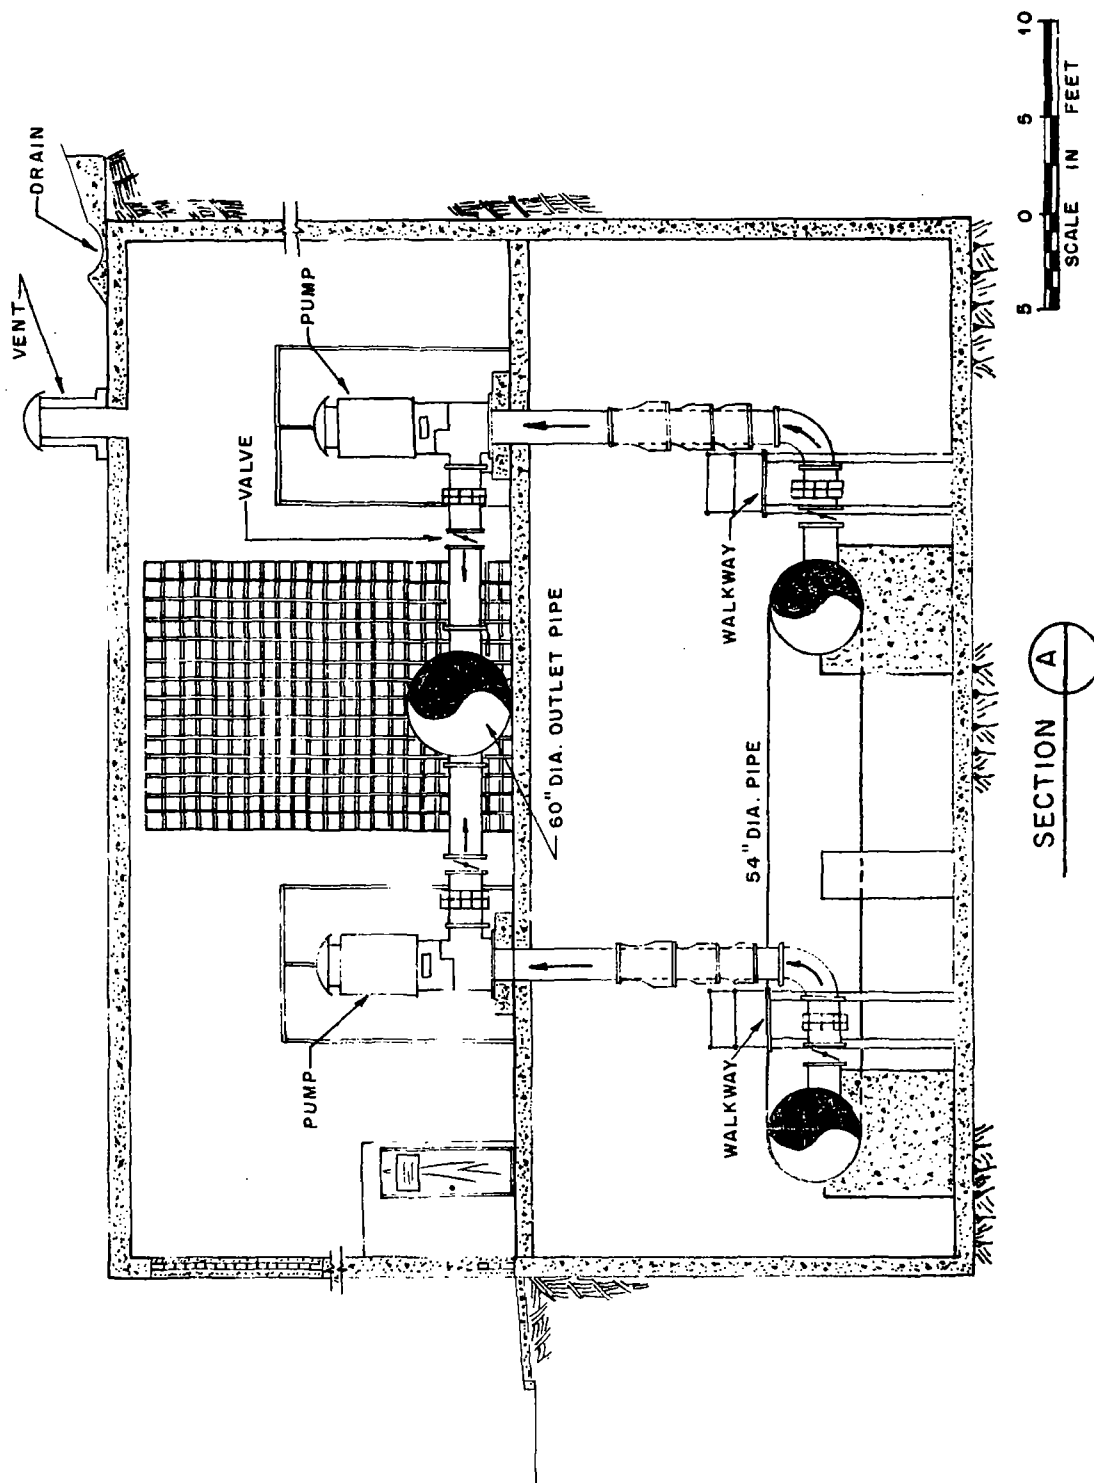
SECTION - OROPOUCHE RAW WATER PUMP STATION
